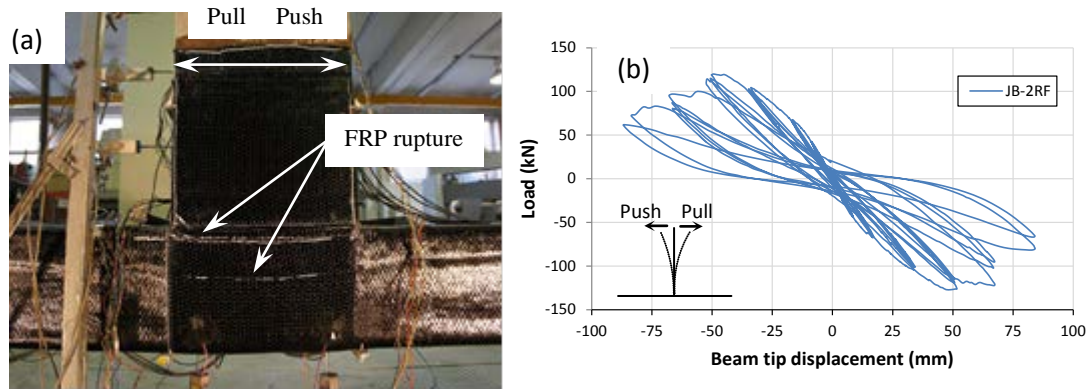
(a) Failure mode of joint JB-2RF, and (b) typical load-beam tip displacement of CFRP-strengthened joints
